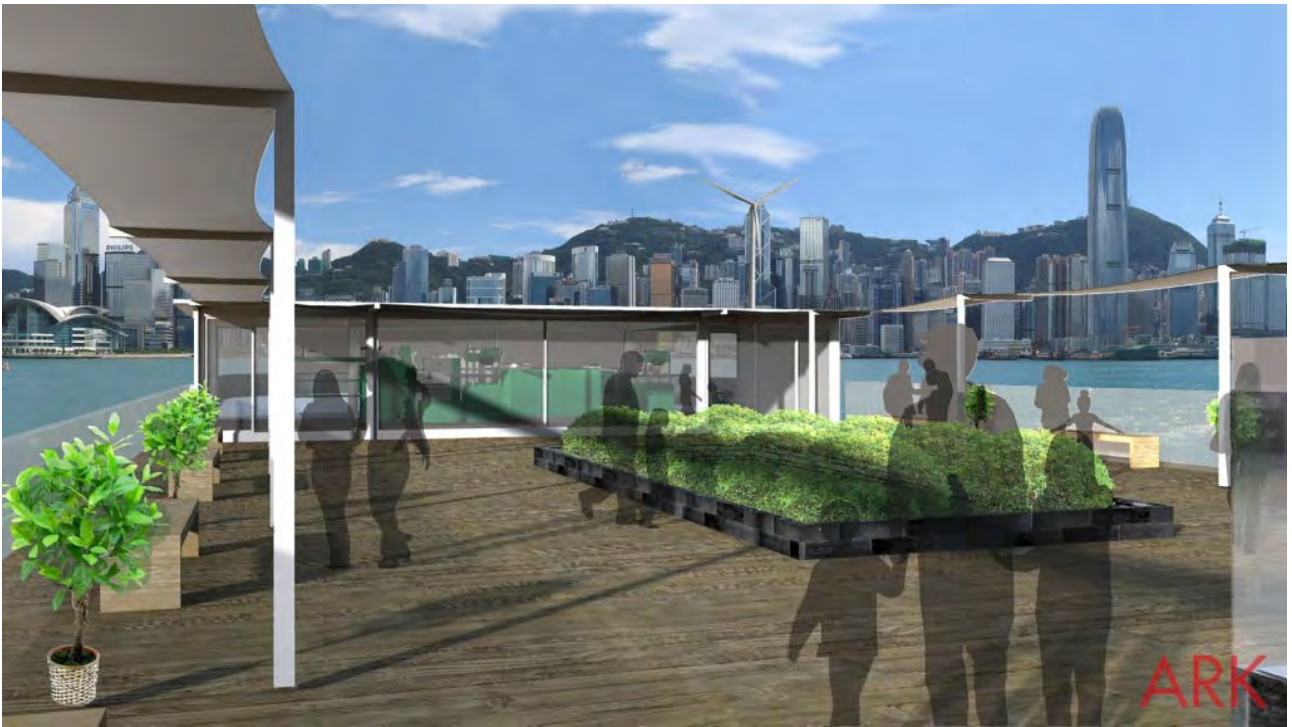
Portions of the walls of the machine room are proposed to be converted to glass for the public to view the original machinery working. Public access will be available through this to the end of the piers.
